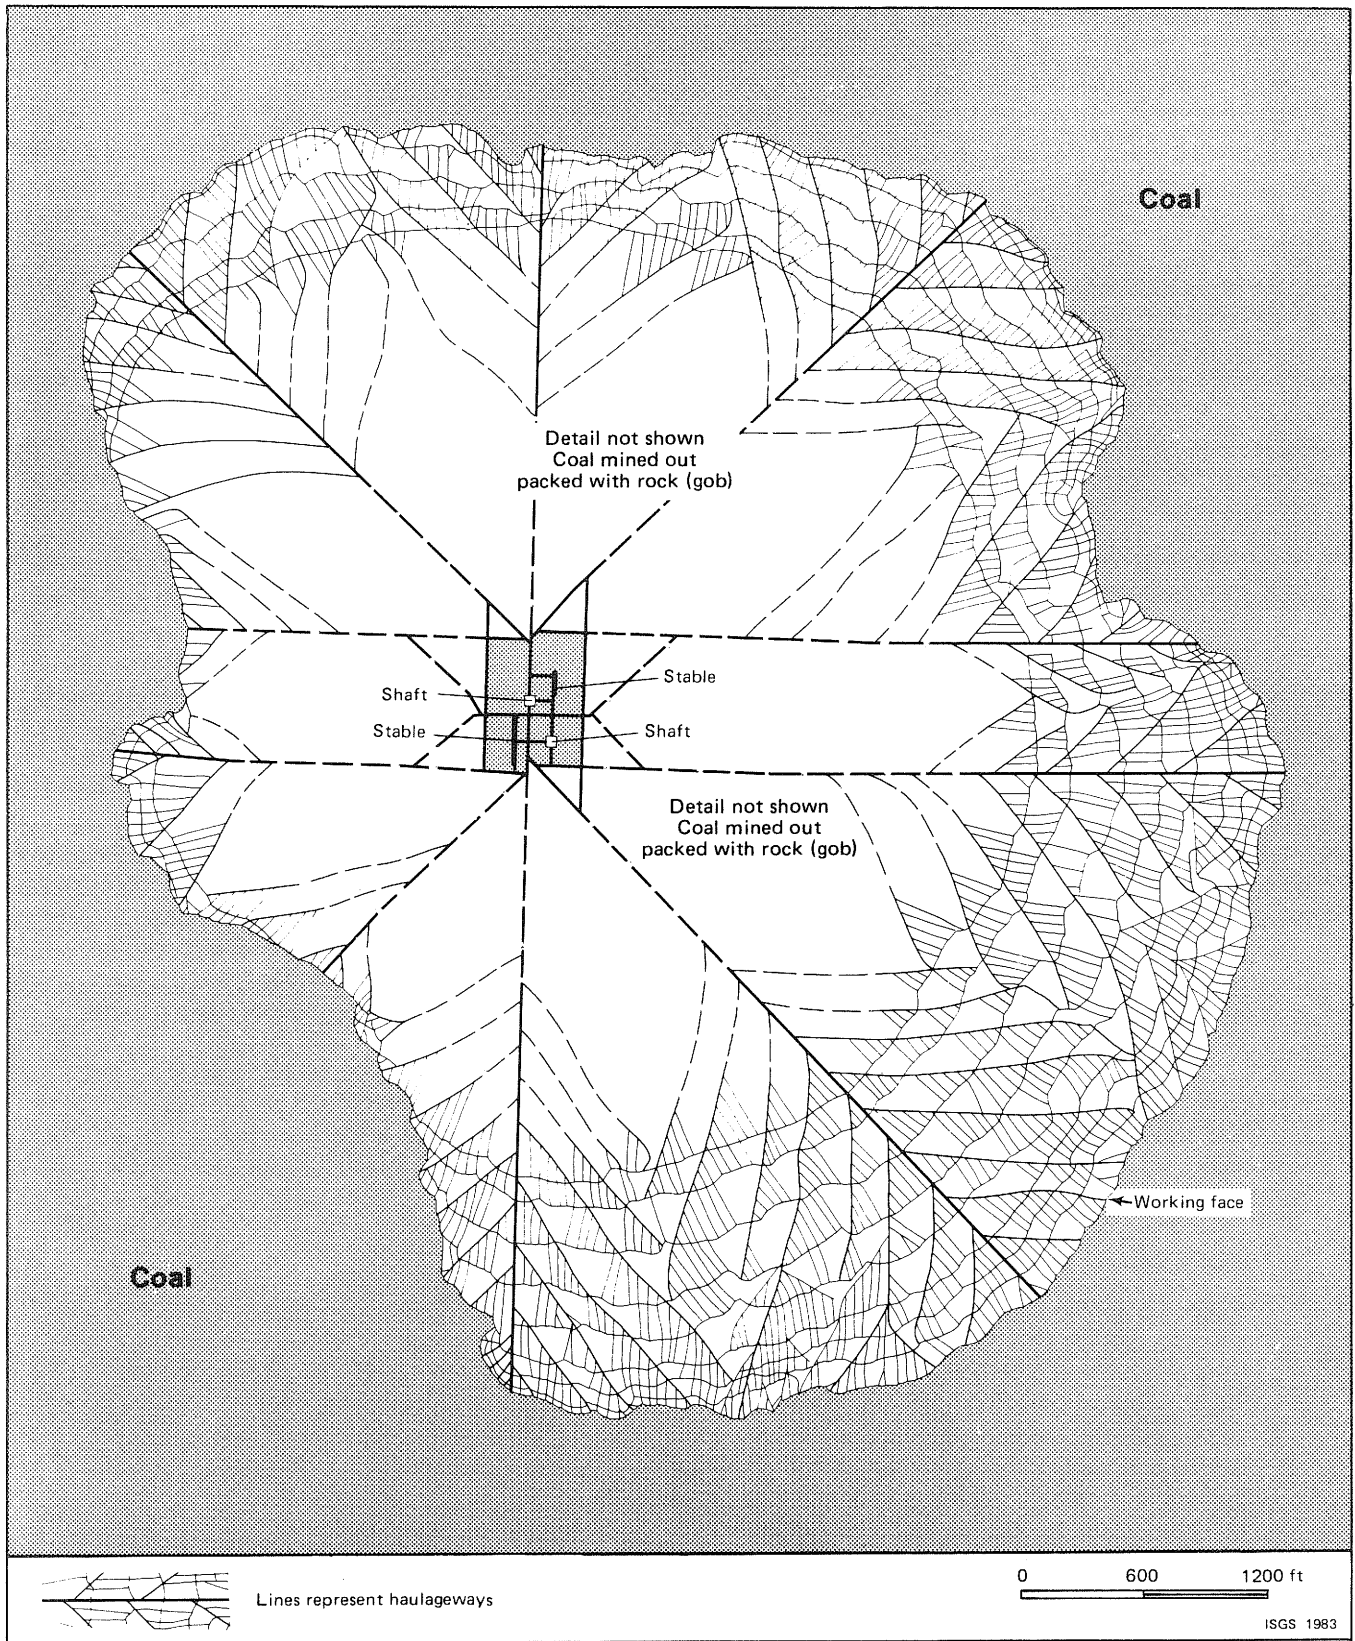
Plan view of a typical mine in the historic Longwall Mining District.
